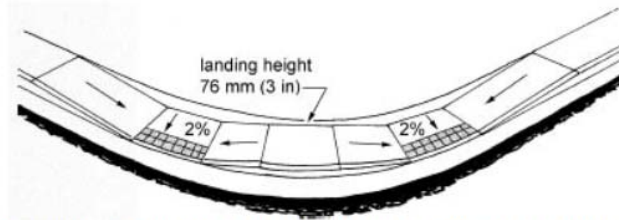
At intersections with narrow sidewalks and wide turning radii, two parallel curb ramps should be considered.
